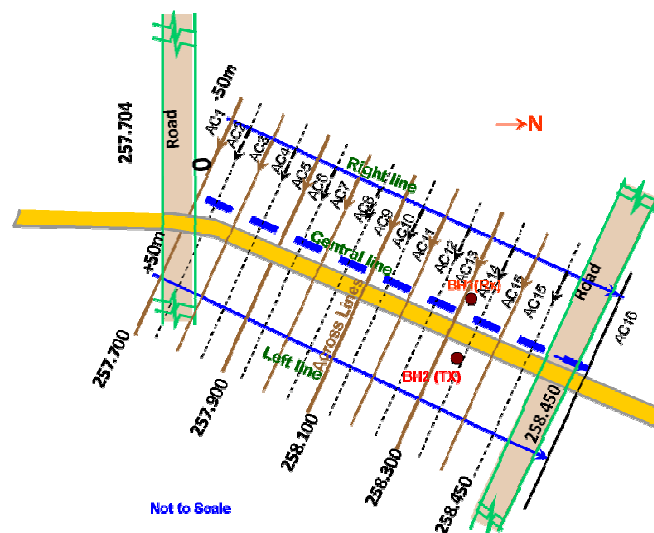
Site Plan showing proposed lines of survey at Kajora area
